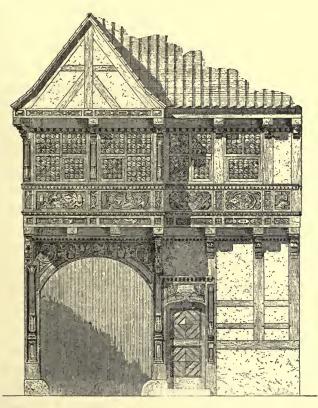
Hildesheim, Germany: Wooden framed house. Close of sixteenth century.
